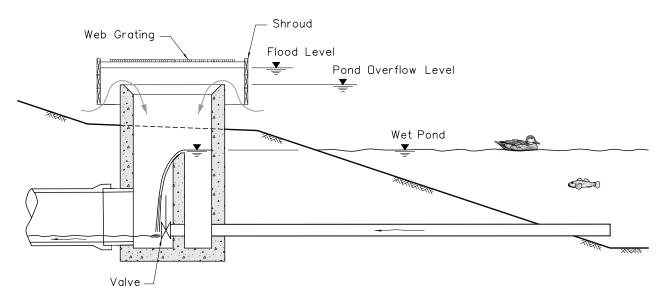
Design schematic for a submerged and shrouded outlet from a wet pond, that will ensure floatables are retained within the wet pond and not carried downstream.
